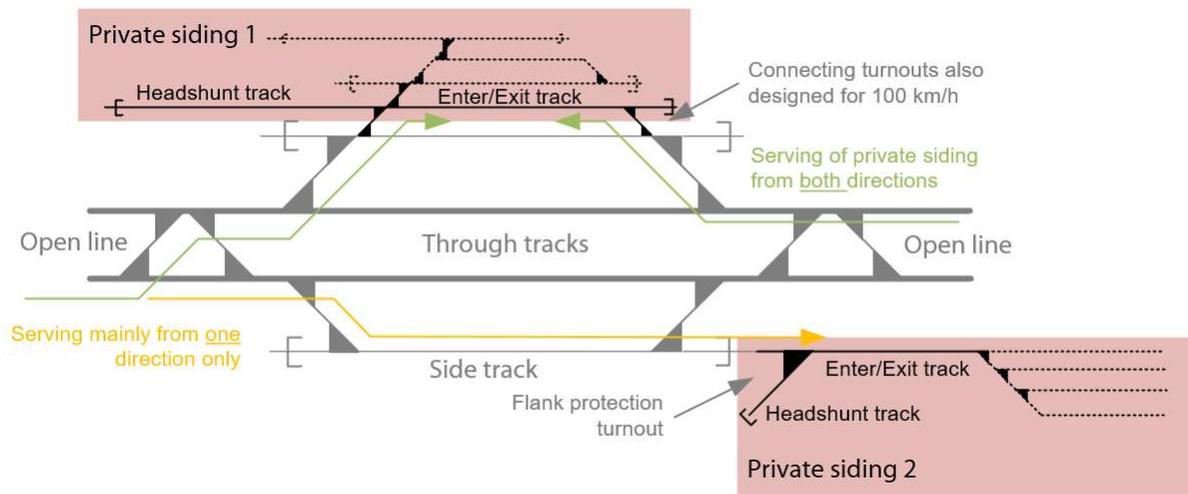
Example of connections of adjacent facilities in a typical station (passing loop)
